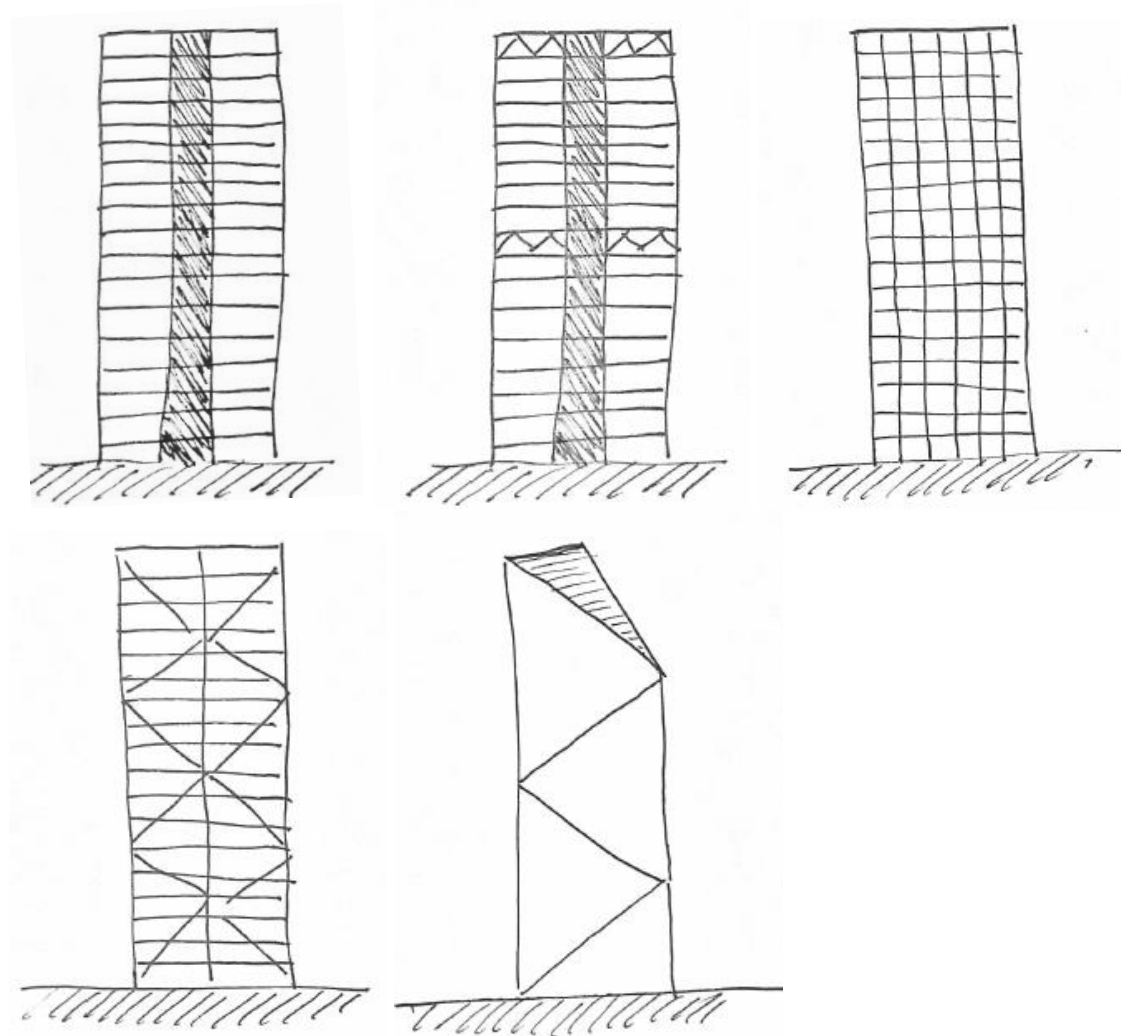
The structural systems chosen to investigate are stabilizing core, stabilizing core with outriggers, façade tube structures, truss tube structures and space structures.
